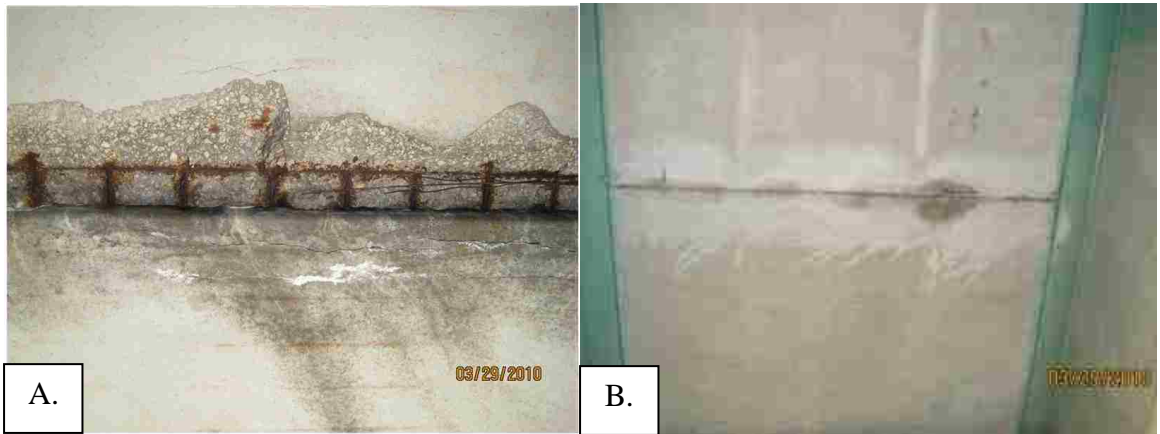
Images of bridge deterioration from St. Louis bridge investigation (A. Worst case spalling found in Bridge A4067, B. Panel joint experiencing waterstaining and efflorescence in Bridge A4705)
